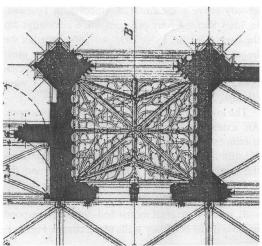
Church of Saint-Etienne-le-Vieux in Caen. Plan of the Porch's ceiling, executed by Brunet in 1901
